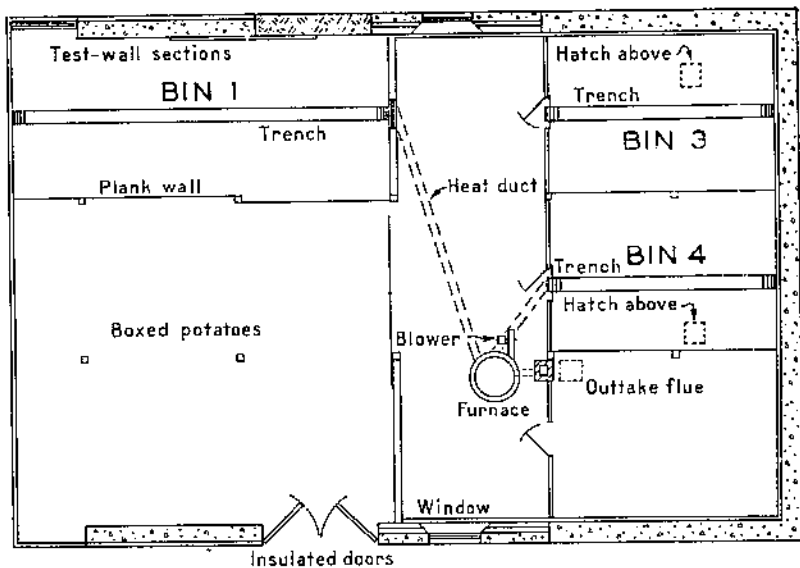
Plan of Aroostook Experiment Farm storage and test-wall sections.
